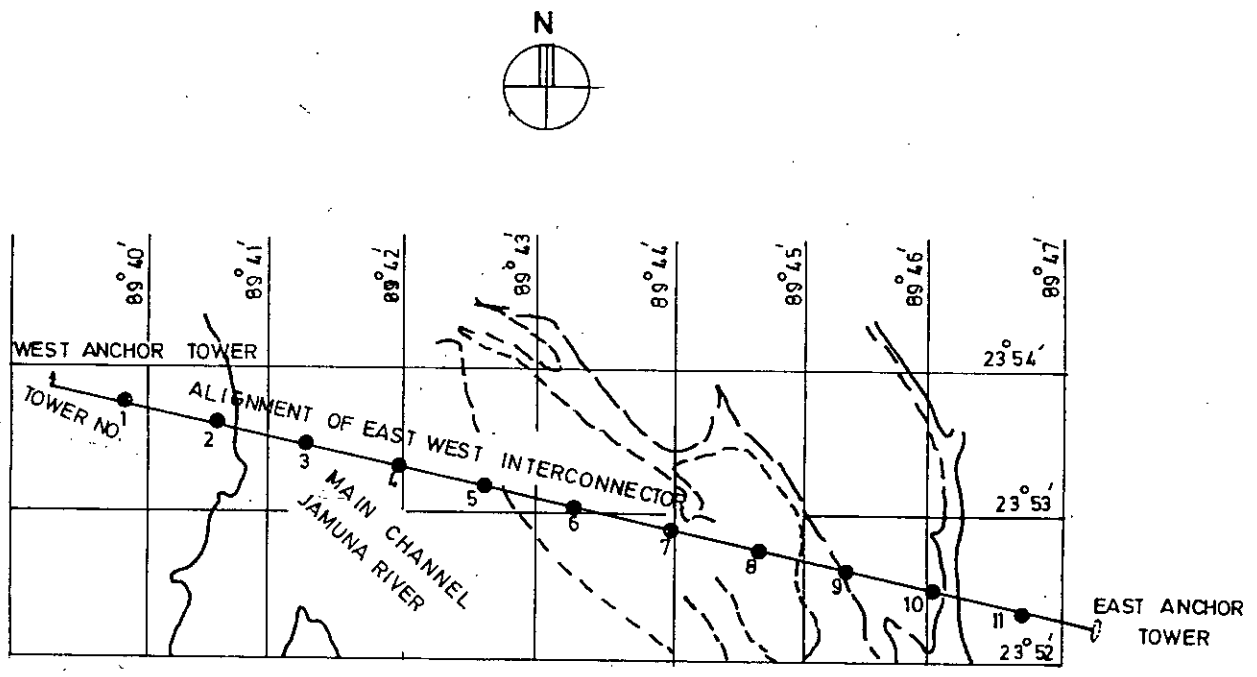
JAMUNA RIVER CROSSING PLAN
